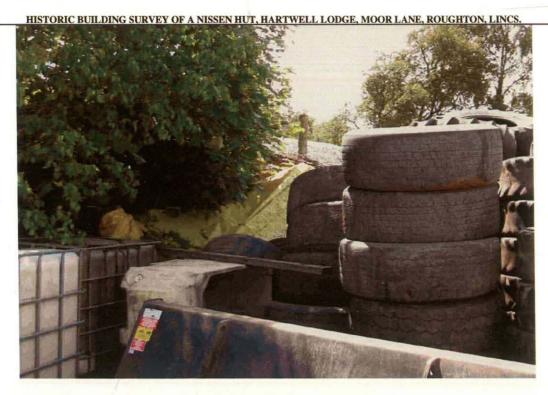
View toward extension (Room 3), showing chimney and roof, and stacked materials preventing access, looking west
